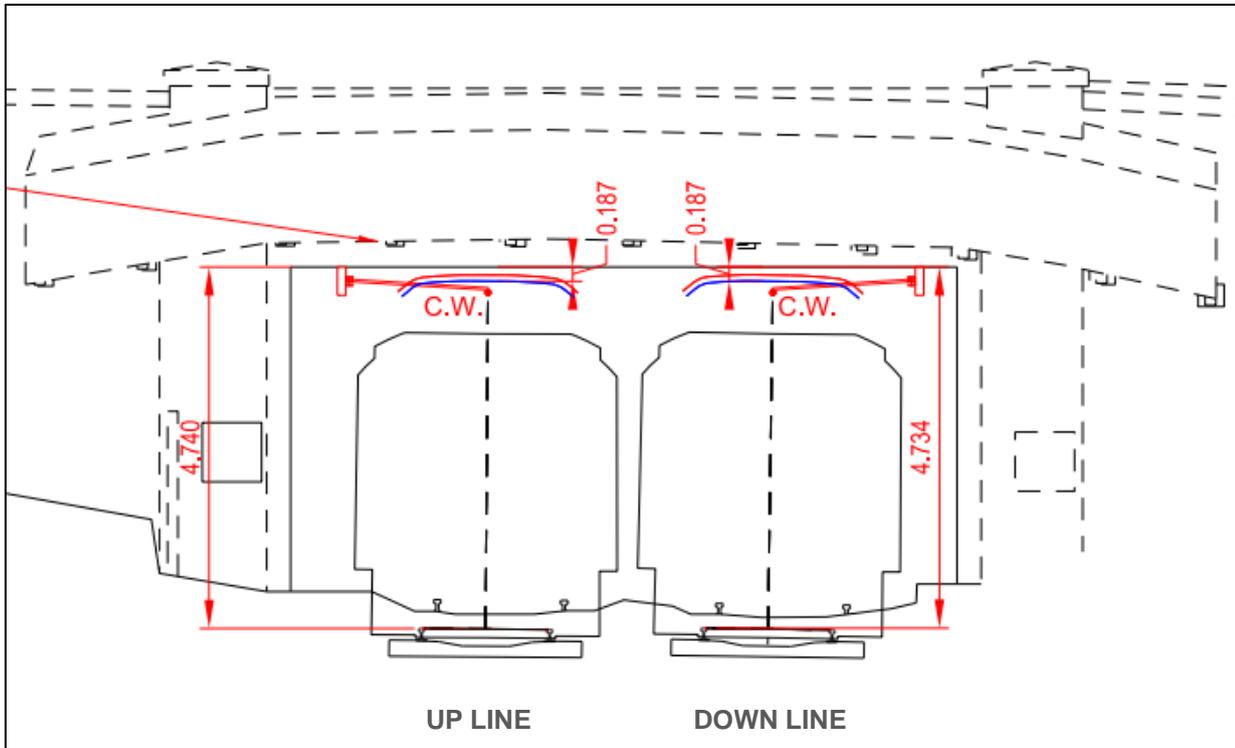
Example cross section for fitted OHLE system in twin area.
